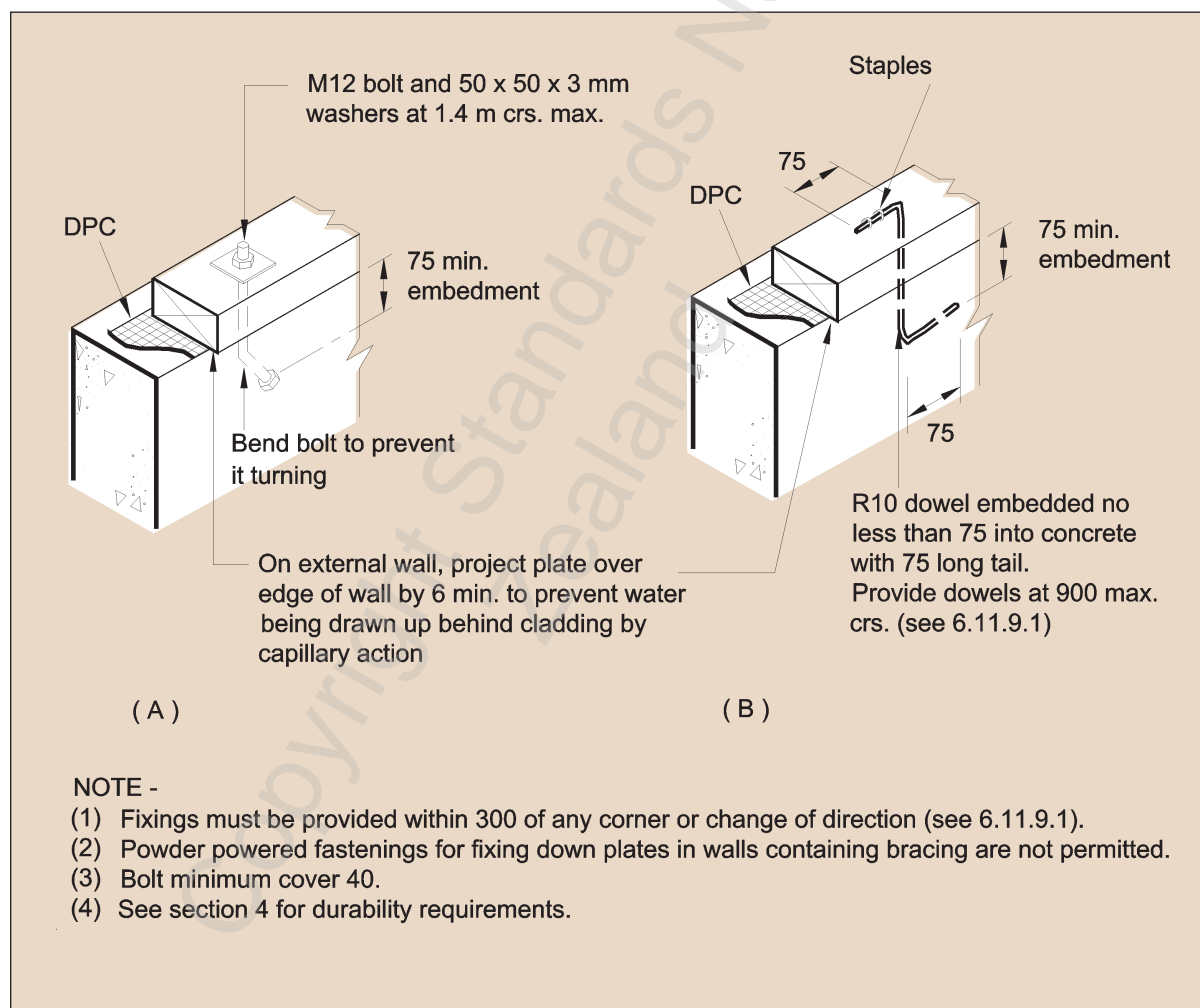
Fixing of wall plates to foundation walls (see 6.11.9)
